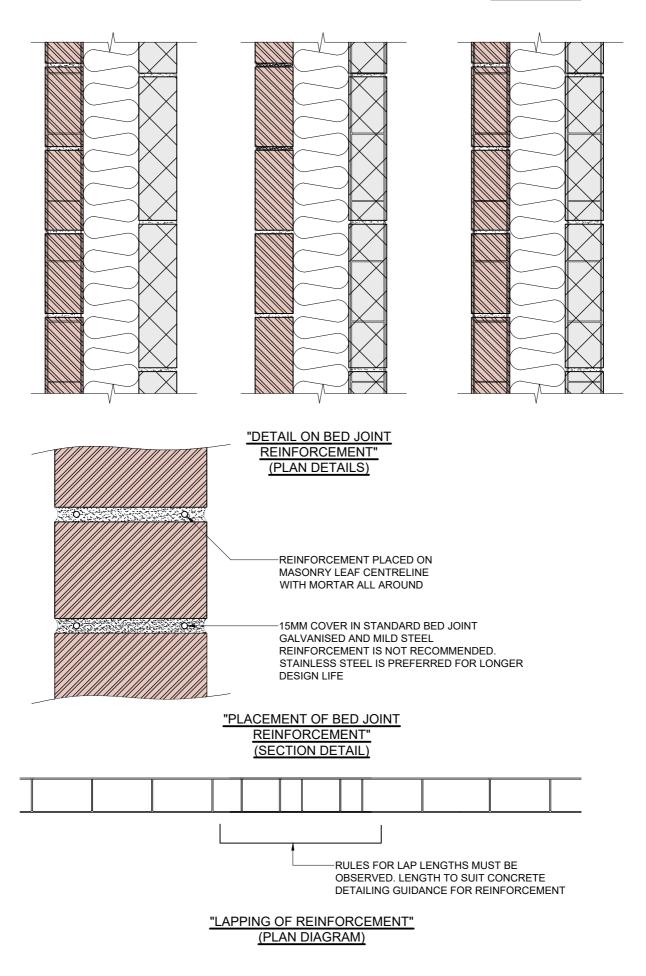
# DETAILS RELATING TO THE REINFORCEMENT OF MASONRY
